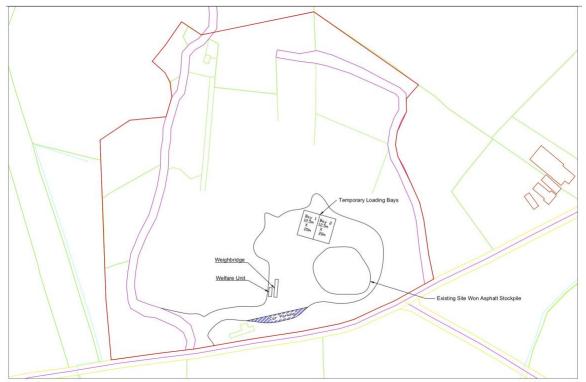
Site Layout of proposed facilities at refurbished quarry
